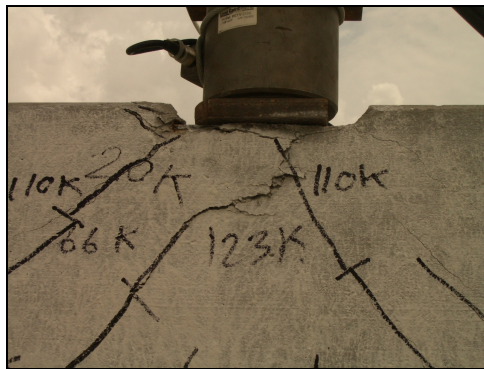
Big crack 45 degree at the corner of the window opening occur at failure load
